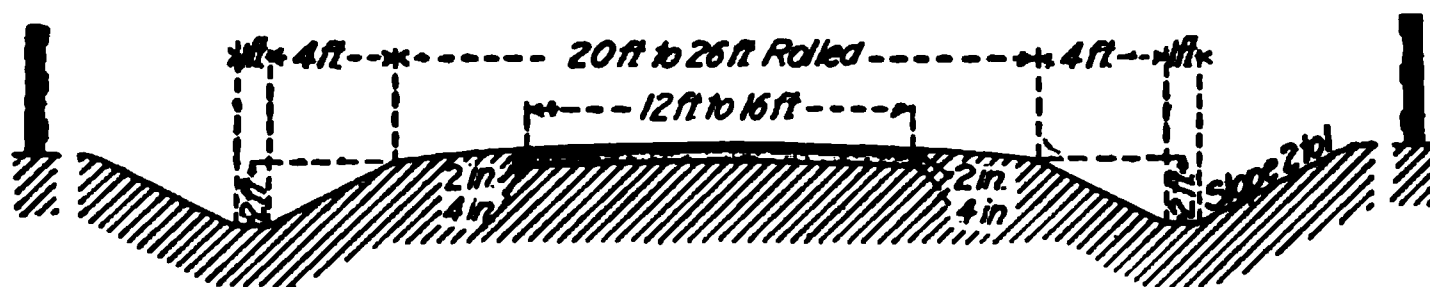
STANDARD SECTION FOR NEW YORK STATE-AID ROADS.
